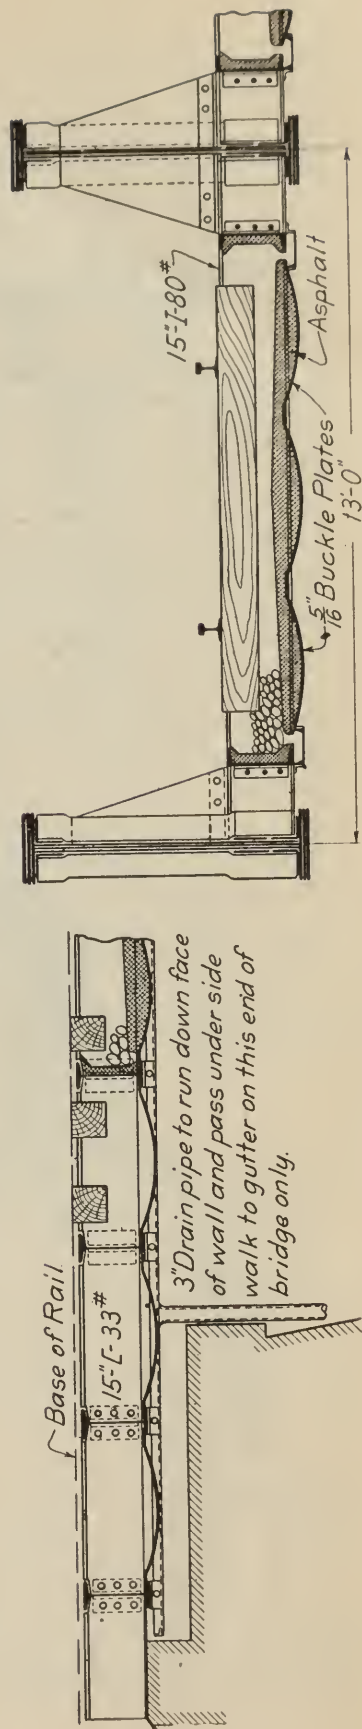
Ballasted, Shallow Floor Bridge in Highland Park, Ill.
